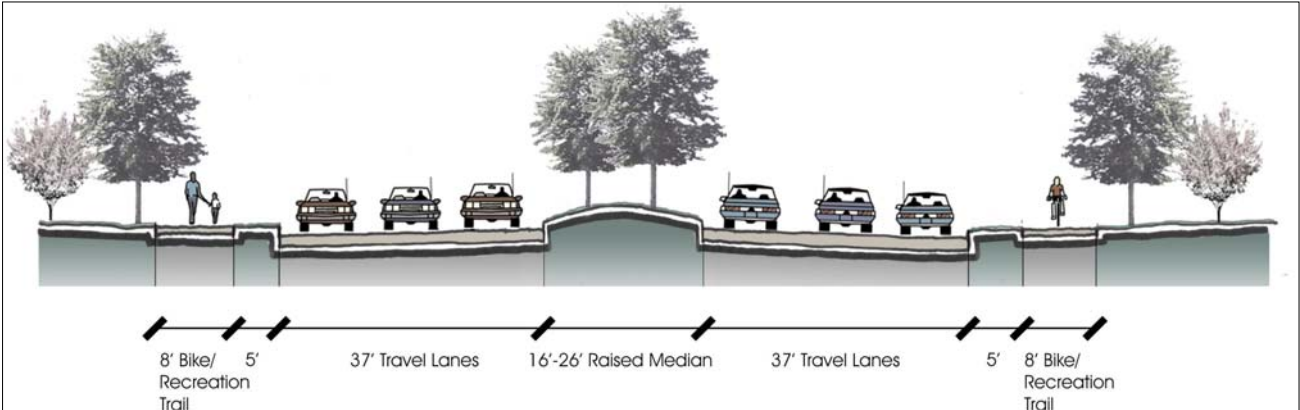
Typical Cross-Section – Route 221 (Route 663 to West of Enterprise Drive)
